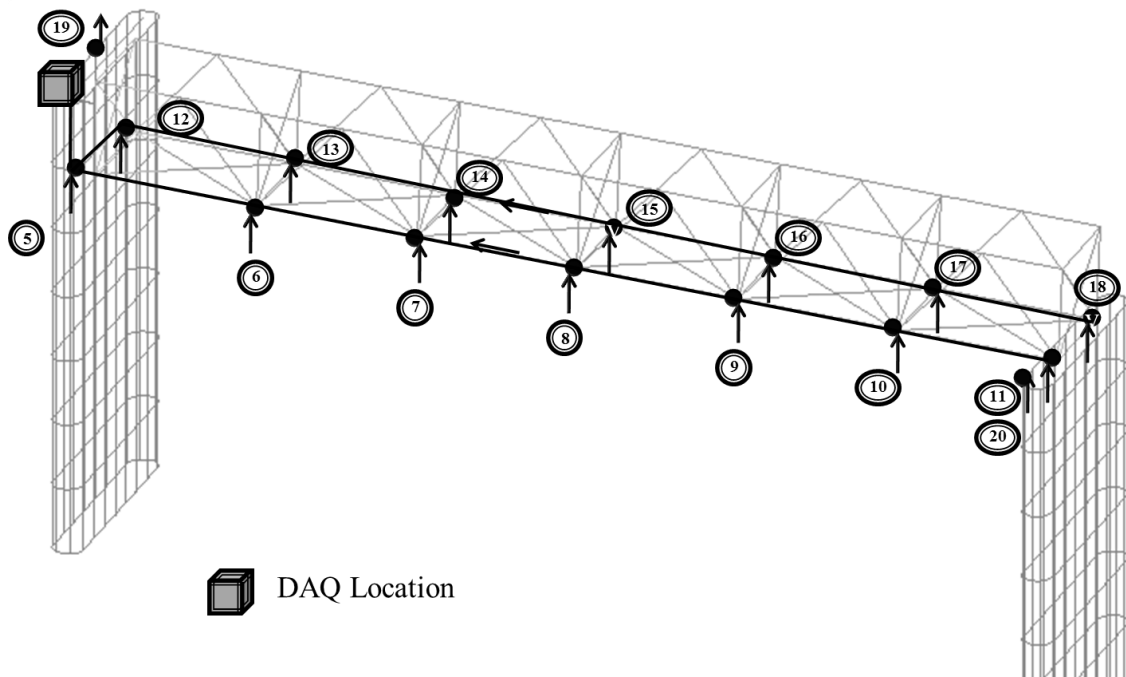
NJ Truss Span Vertical Instrumentation Plan
